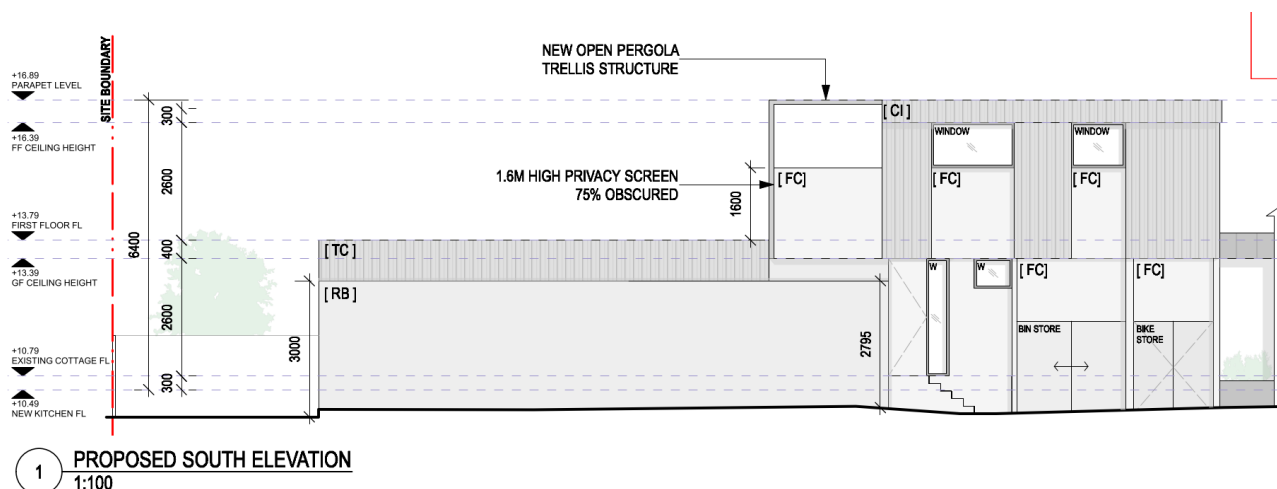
Amended First Floor Addition Design – Drawings dated 15 May 2023, showing reduction in wall length and removal of upper floor (roof terrace).
